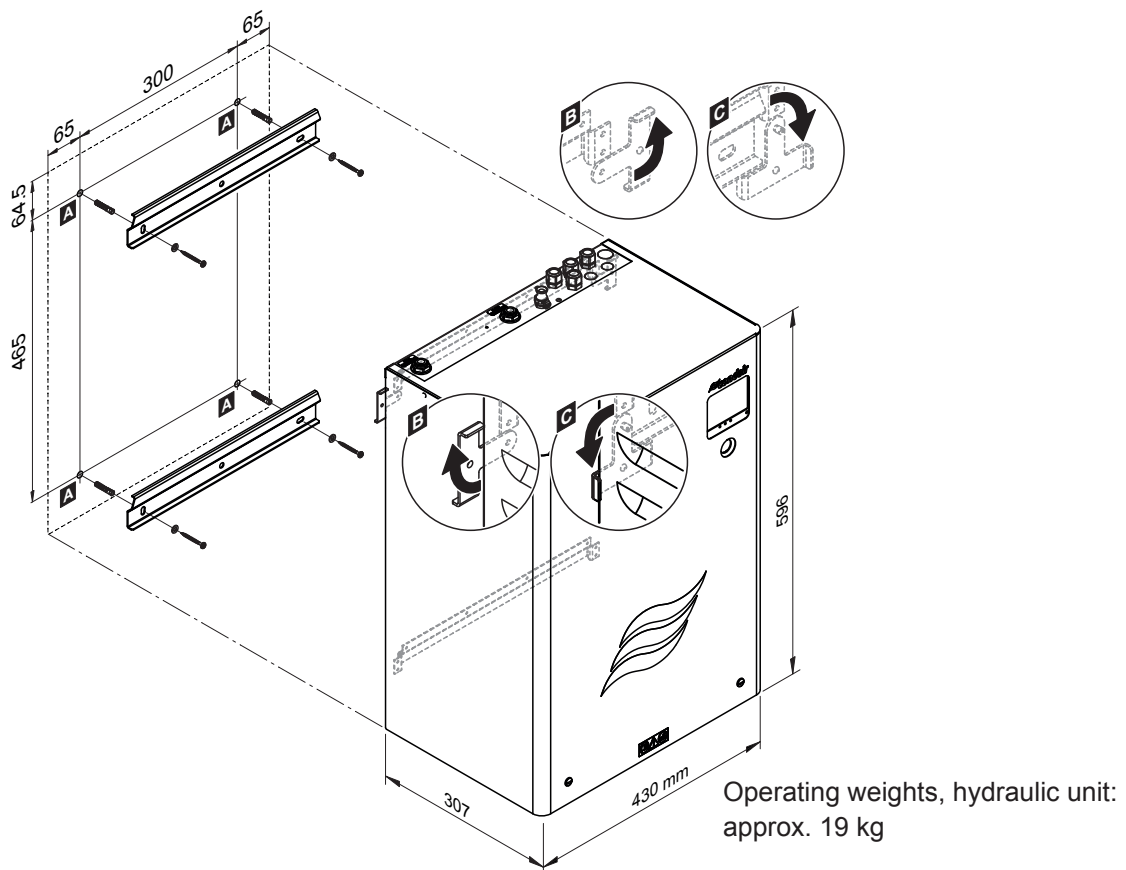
Installation of the hydraulic unit (dimensions in mm)
